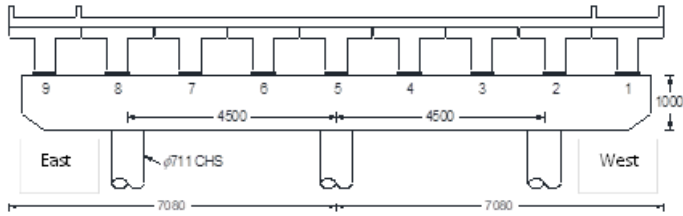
Cross section of trestle bridge at Terminal Petikemas
